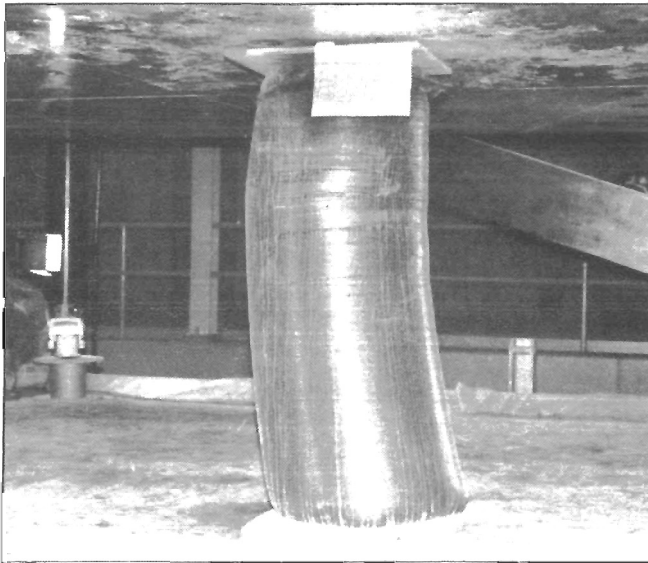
Improved stability of grout bags provided by tying end of bag that makes contact with mine floor.
